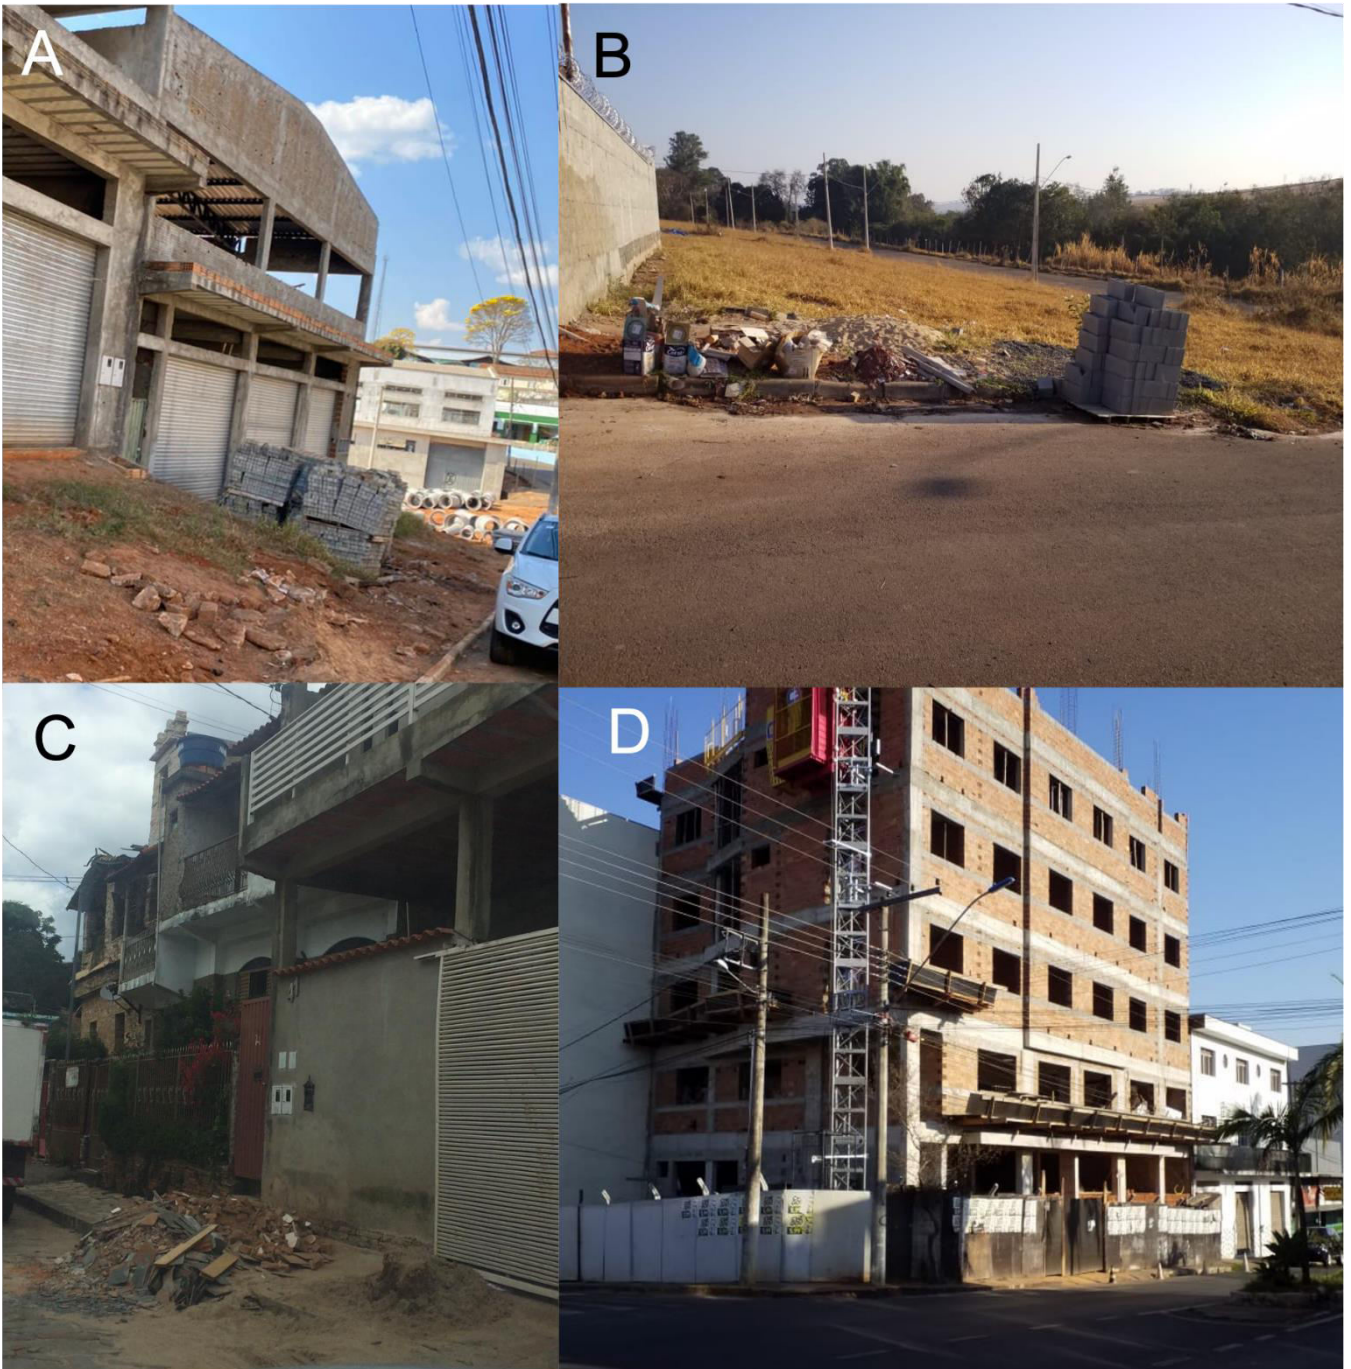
Some photos of the works studied in this work. A. Observe stacked bricks with no support base on sloping terrain. B. Solid waste on side terrain and no bucket, bricks stacked on sidewalk on steep ground, with paint cans [Type D waste]. C. Solid waste disposed on the street and sidewalk along with uninsulated sand [Type B waste]. D. A large construction case with siding without waste and off-site material.
